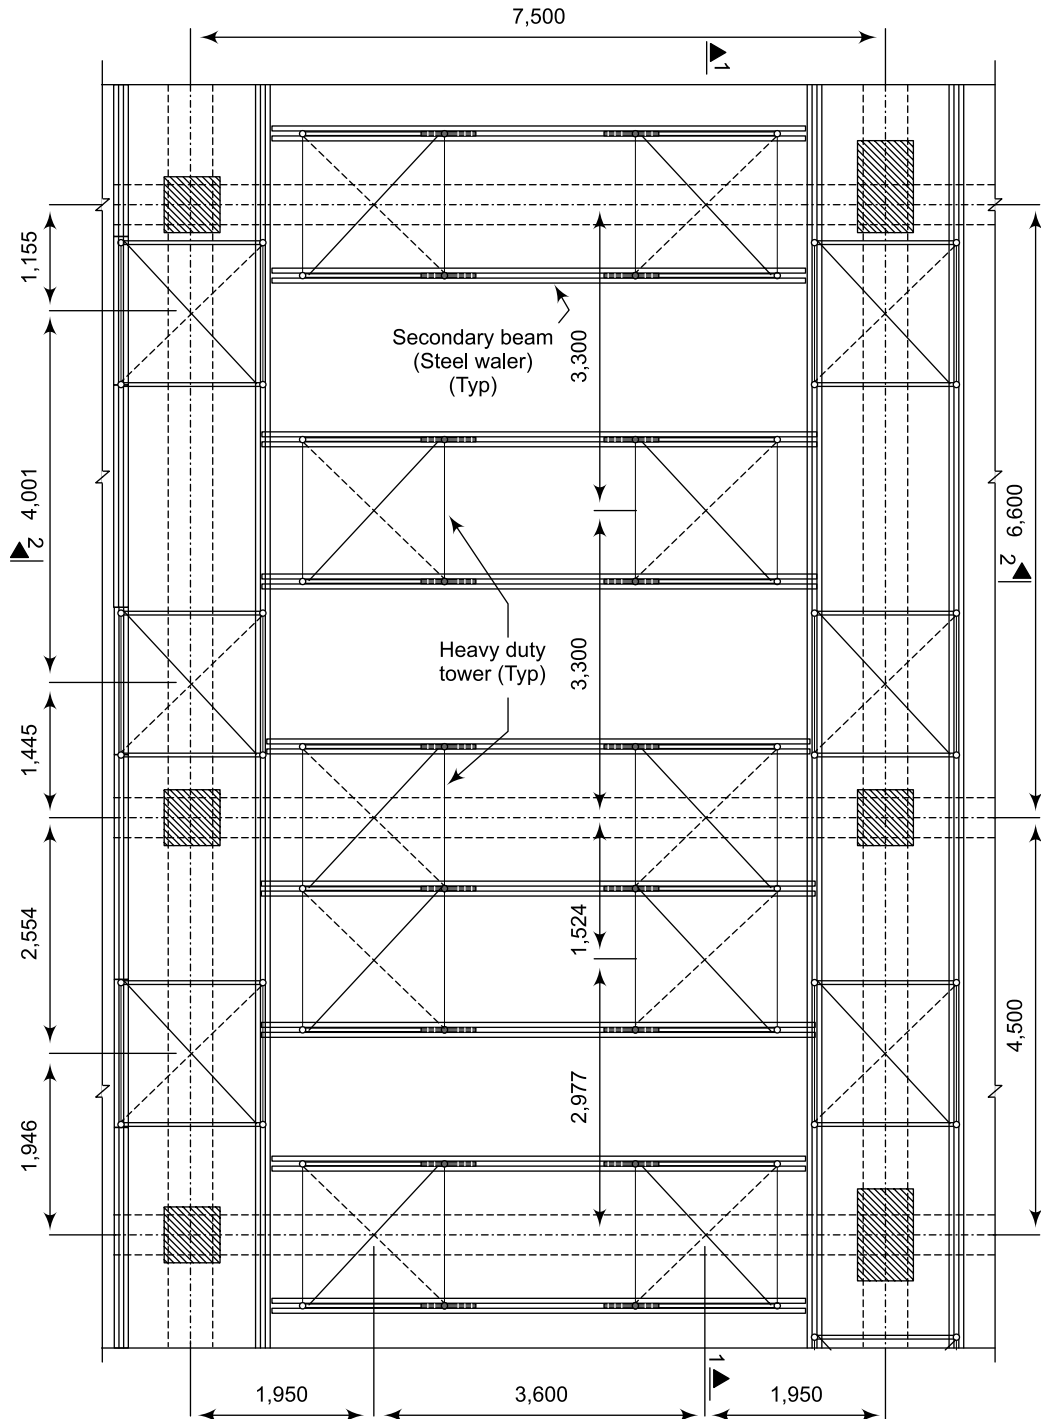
Arrangement of Shoring Towers in Plan for Slab and Beam Formwork.
